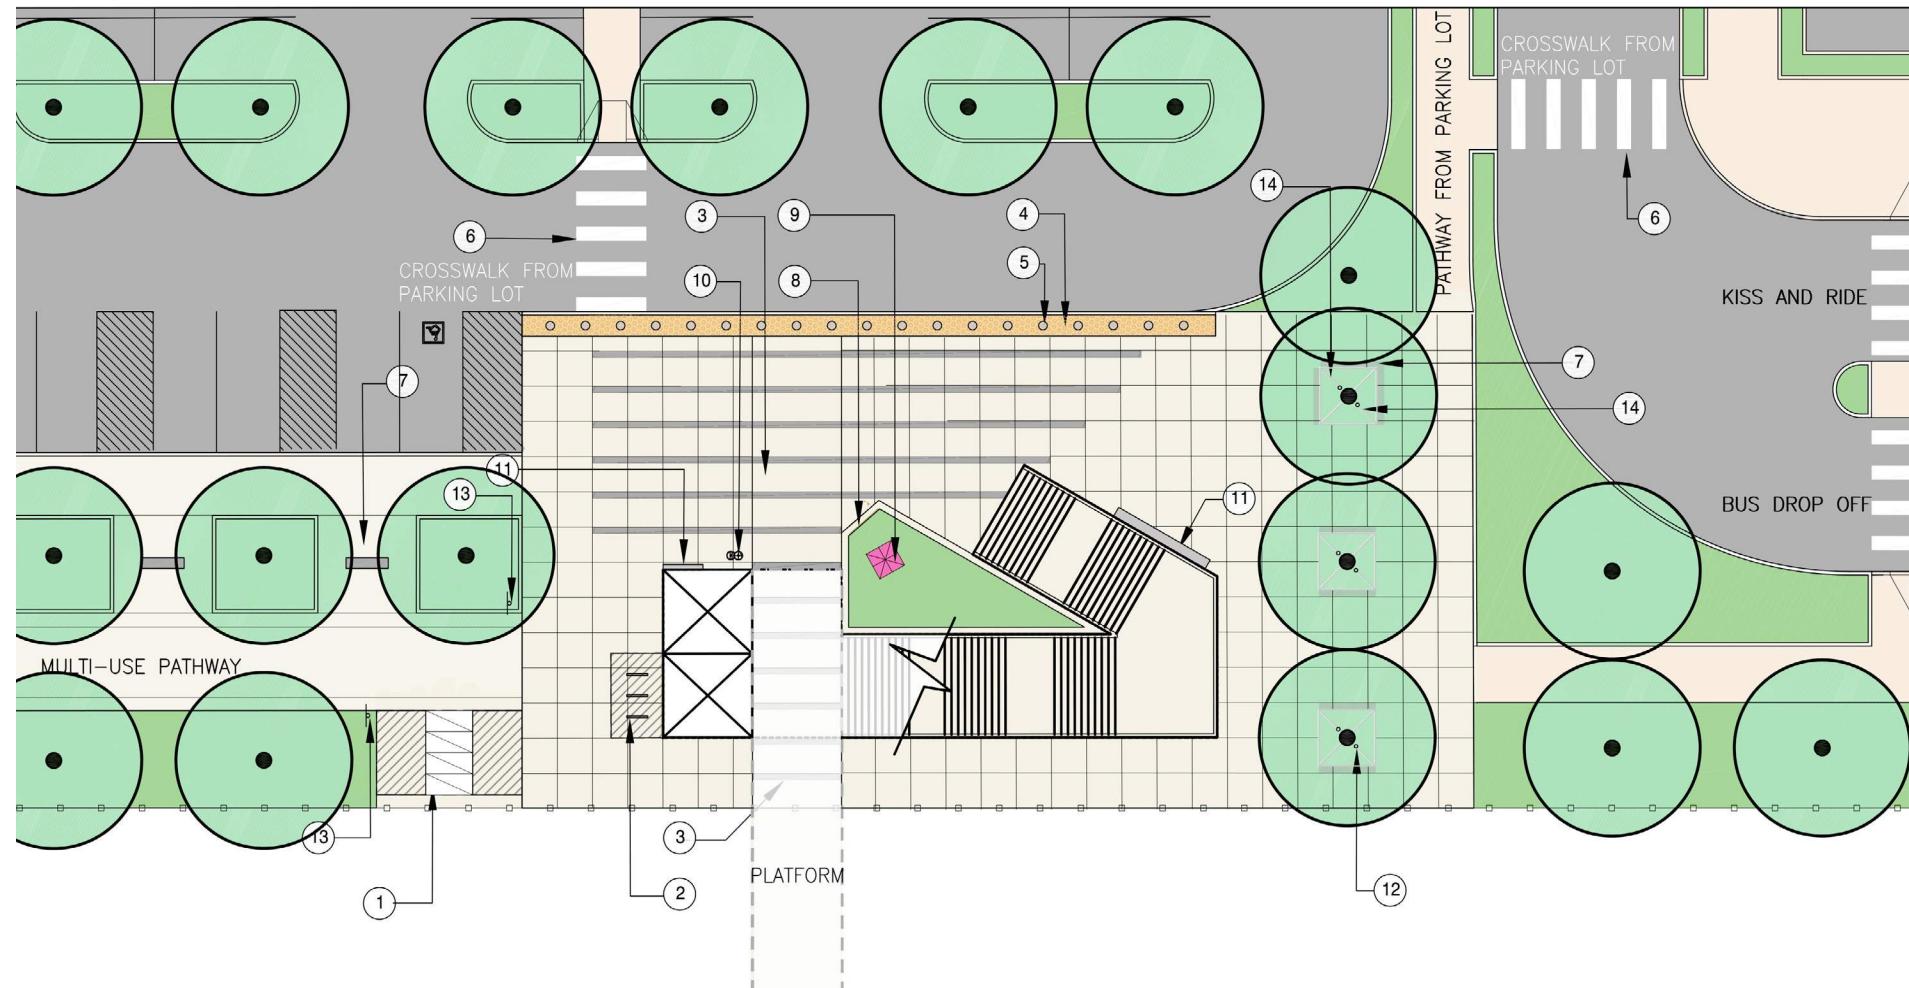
Conceptual View of Station Area Plaza with Drop-Off Elevator Towers, Pedestrian Bridge and Overcrossing
